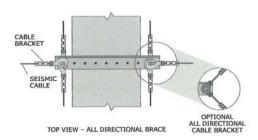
Rectangular duct with vertical rods and braced with cables (all directional).
